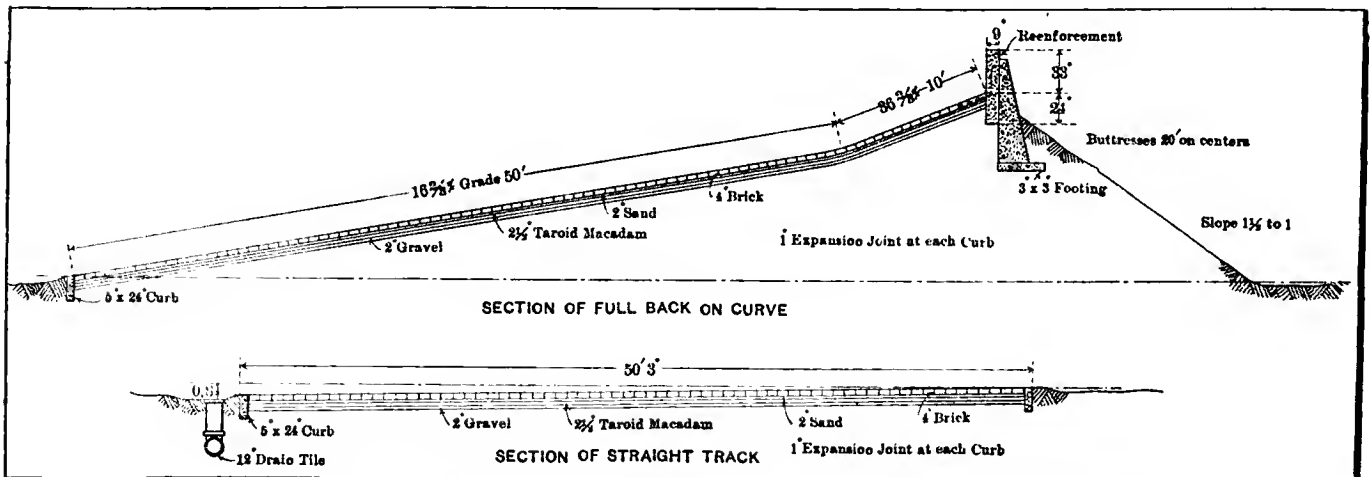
Detail of embankments, showing buttresses, slope, reinforcement, and other details of construction
